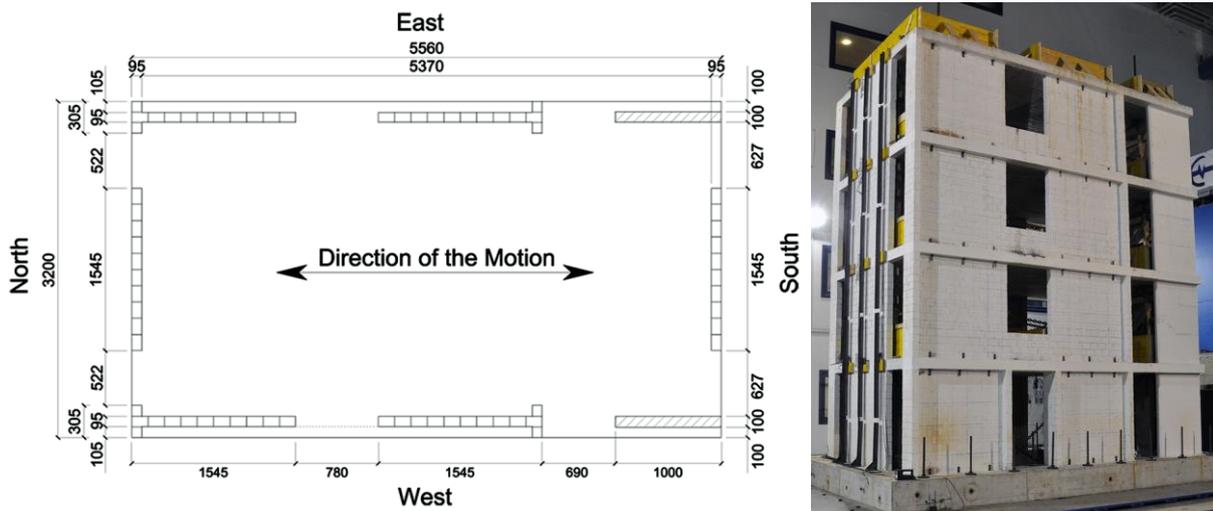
Test specimen: plan view (left) and view of the test specimen on the shake-table (right), measures in mm.
